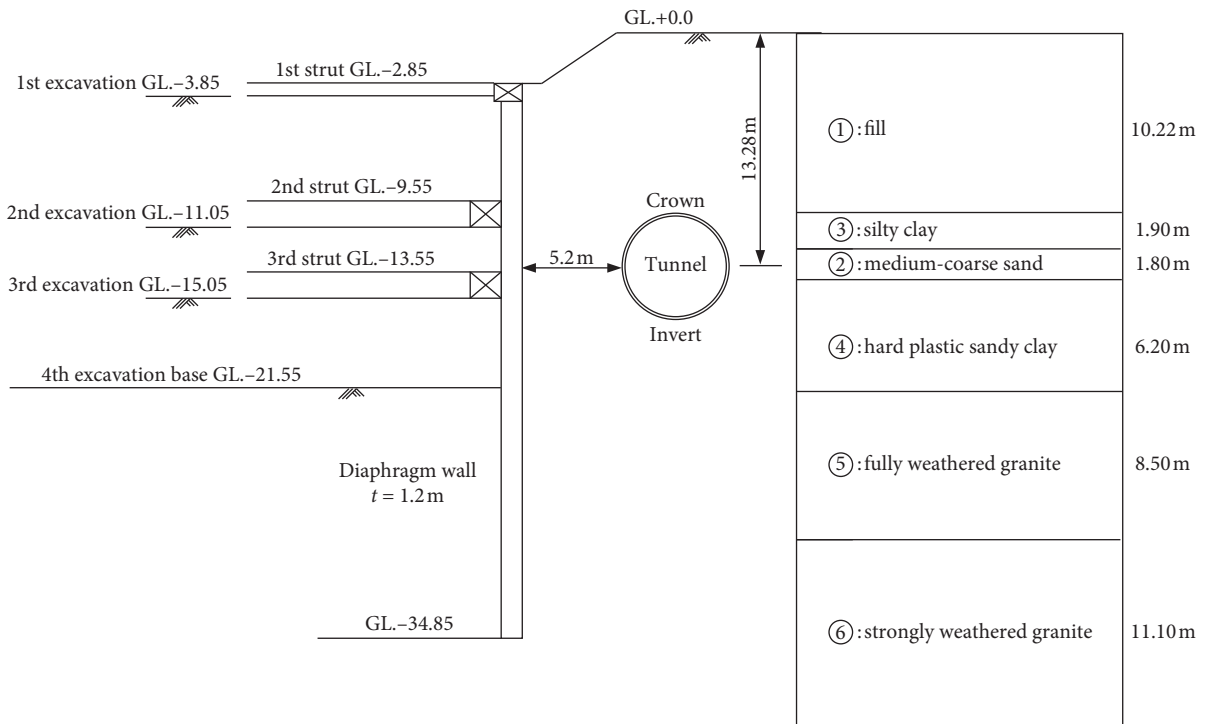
Profile of soil layer, excavation, and tunnel (section A-A).
